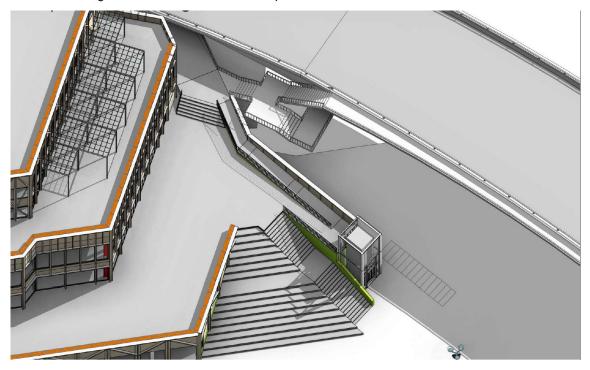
Druitt Street pedestrian connection proposed design (Source: Druitt Bridge Connection, Architectus, 3 September 2021)
